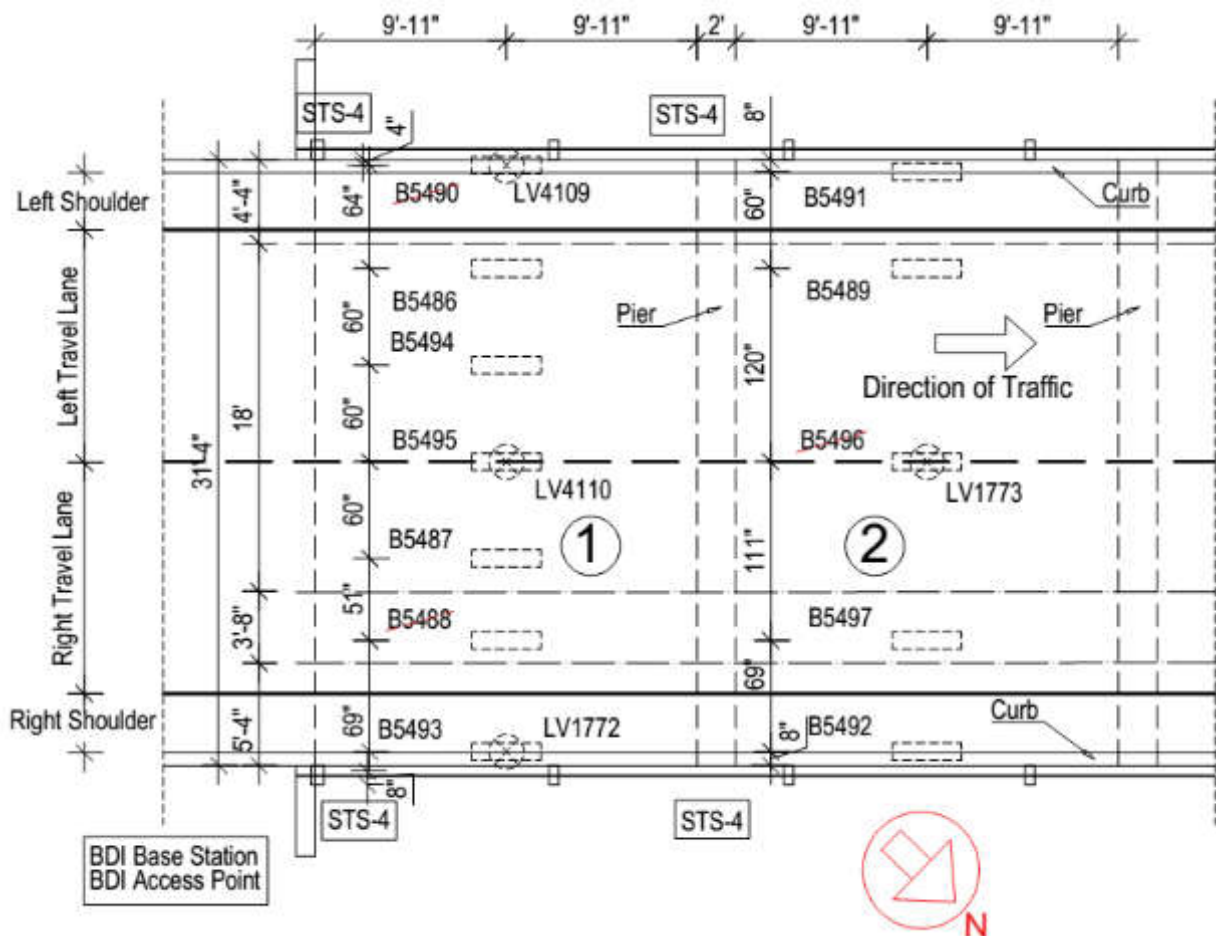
Location of Strain Transducers (BXXXX) and LVDT's (LVXXXX) at the Bottom of the Bridge Slab
